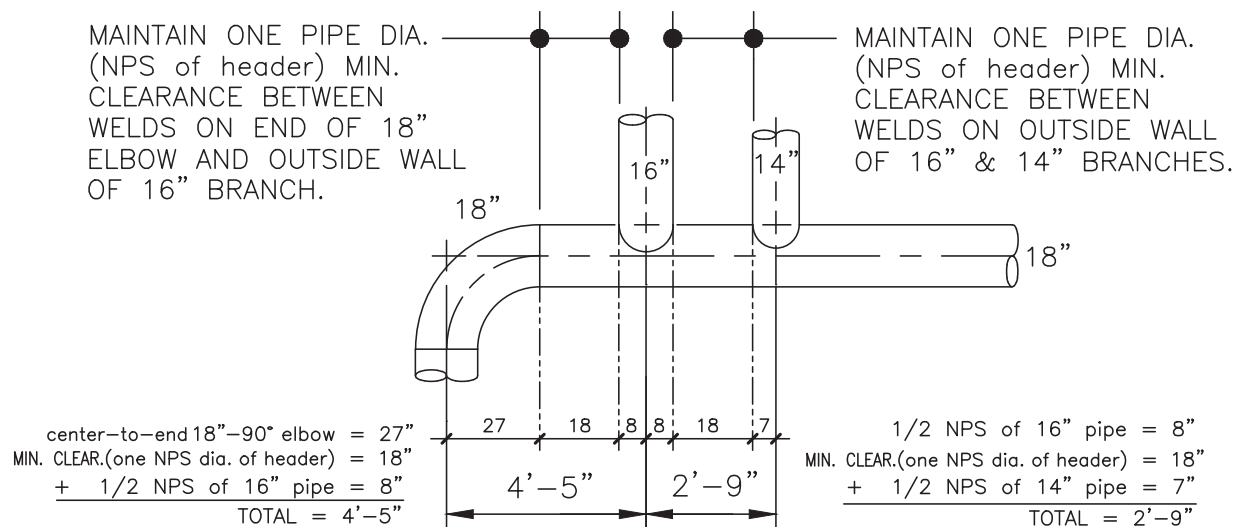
Spacing minimums for welding stub-ins.
